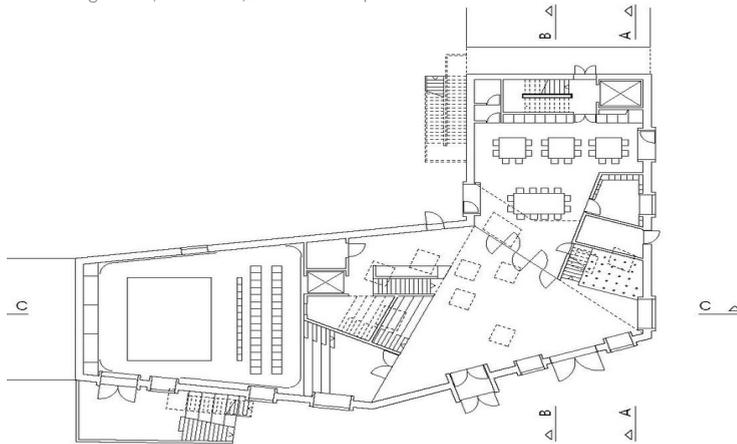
| Ground Floor | Dorte Mandrup Arkitekter
